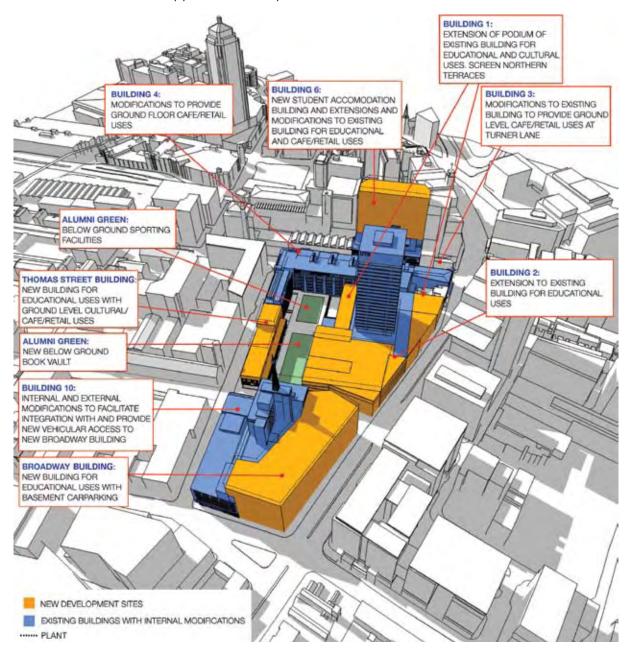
3D Model of Building Envelopes (Source: BVN / JBA)
